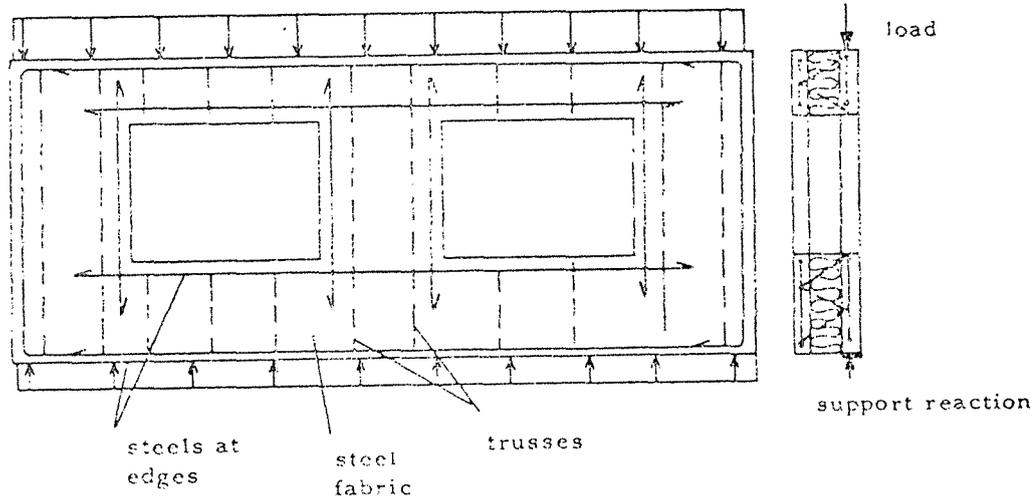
Structure and behaviour of the self-supporting sandwich wall element (drawing of principle).
